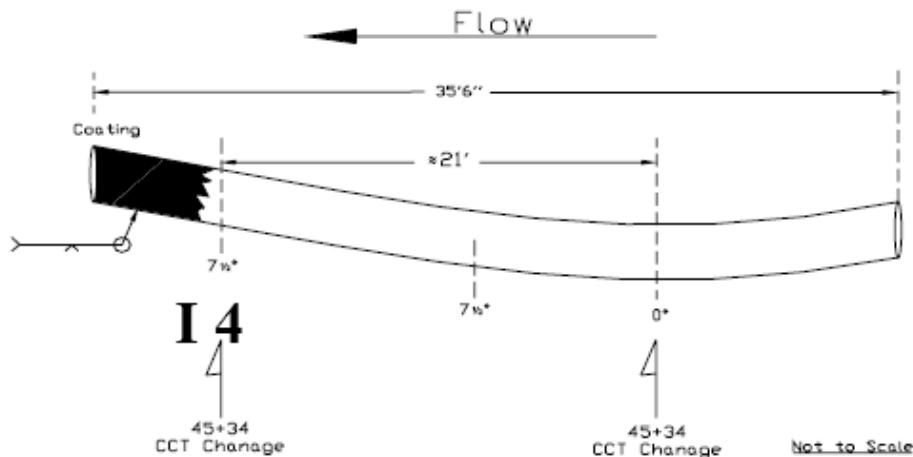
Schematic of Pipe Elevation at DG-ICDA Site 4
